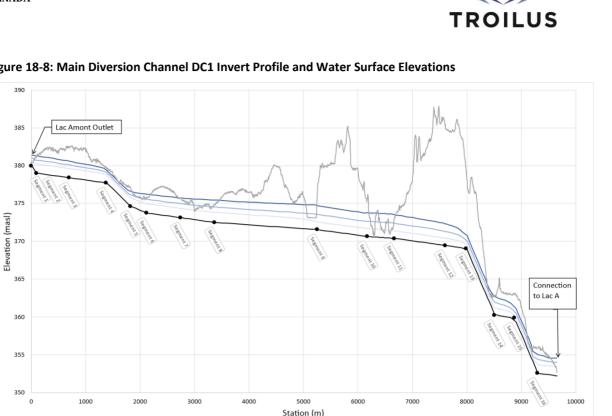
Main Diversion Channel DC1 Invert Profile and Water Surface Elevations
